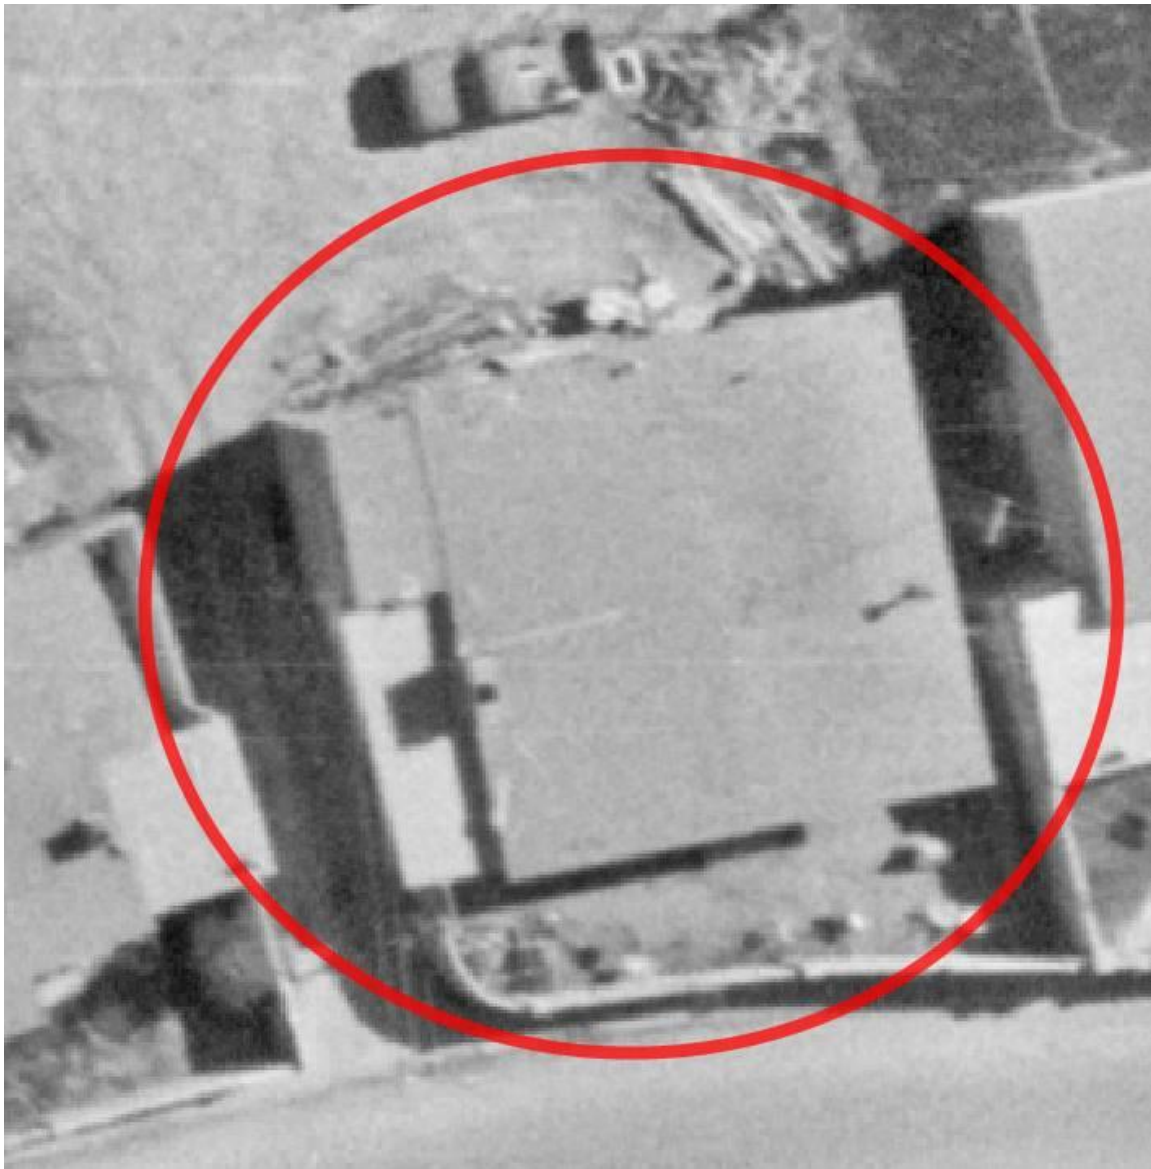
May 11, 1973, aerial photograph. West elevation addition and porch and front wall in place.
